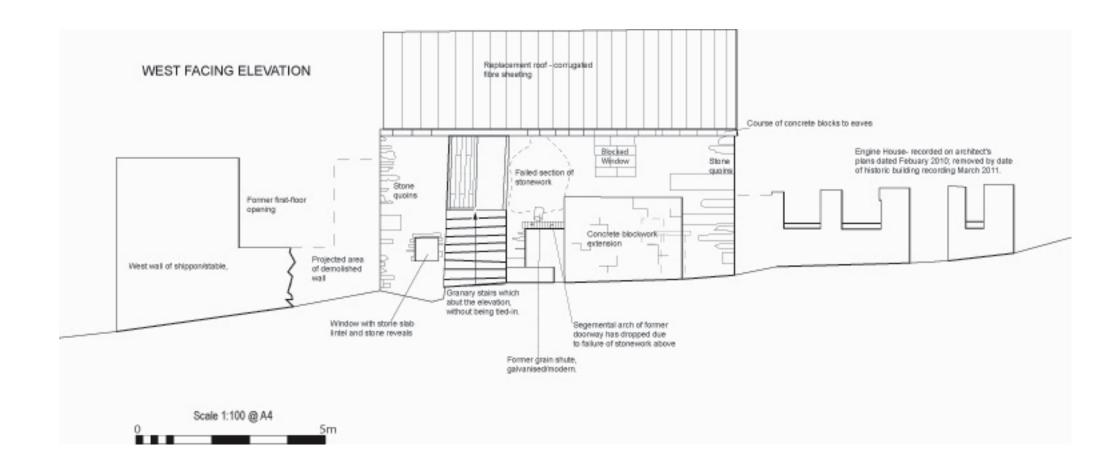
The west elevations of the granary, shippon/stable and extension; scale 1:100.
